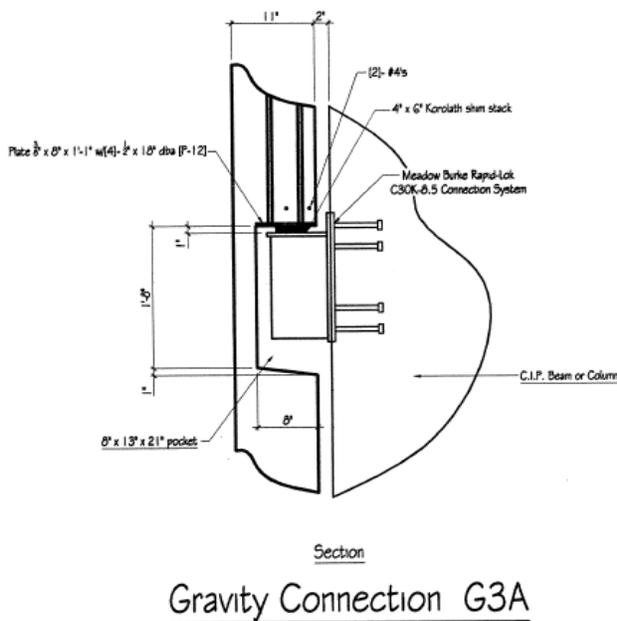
Elevation of remaining vertical connection for facade panel supported at Level 5 Column PD/P1.
